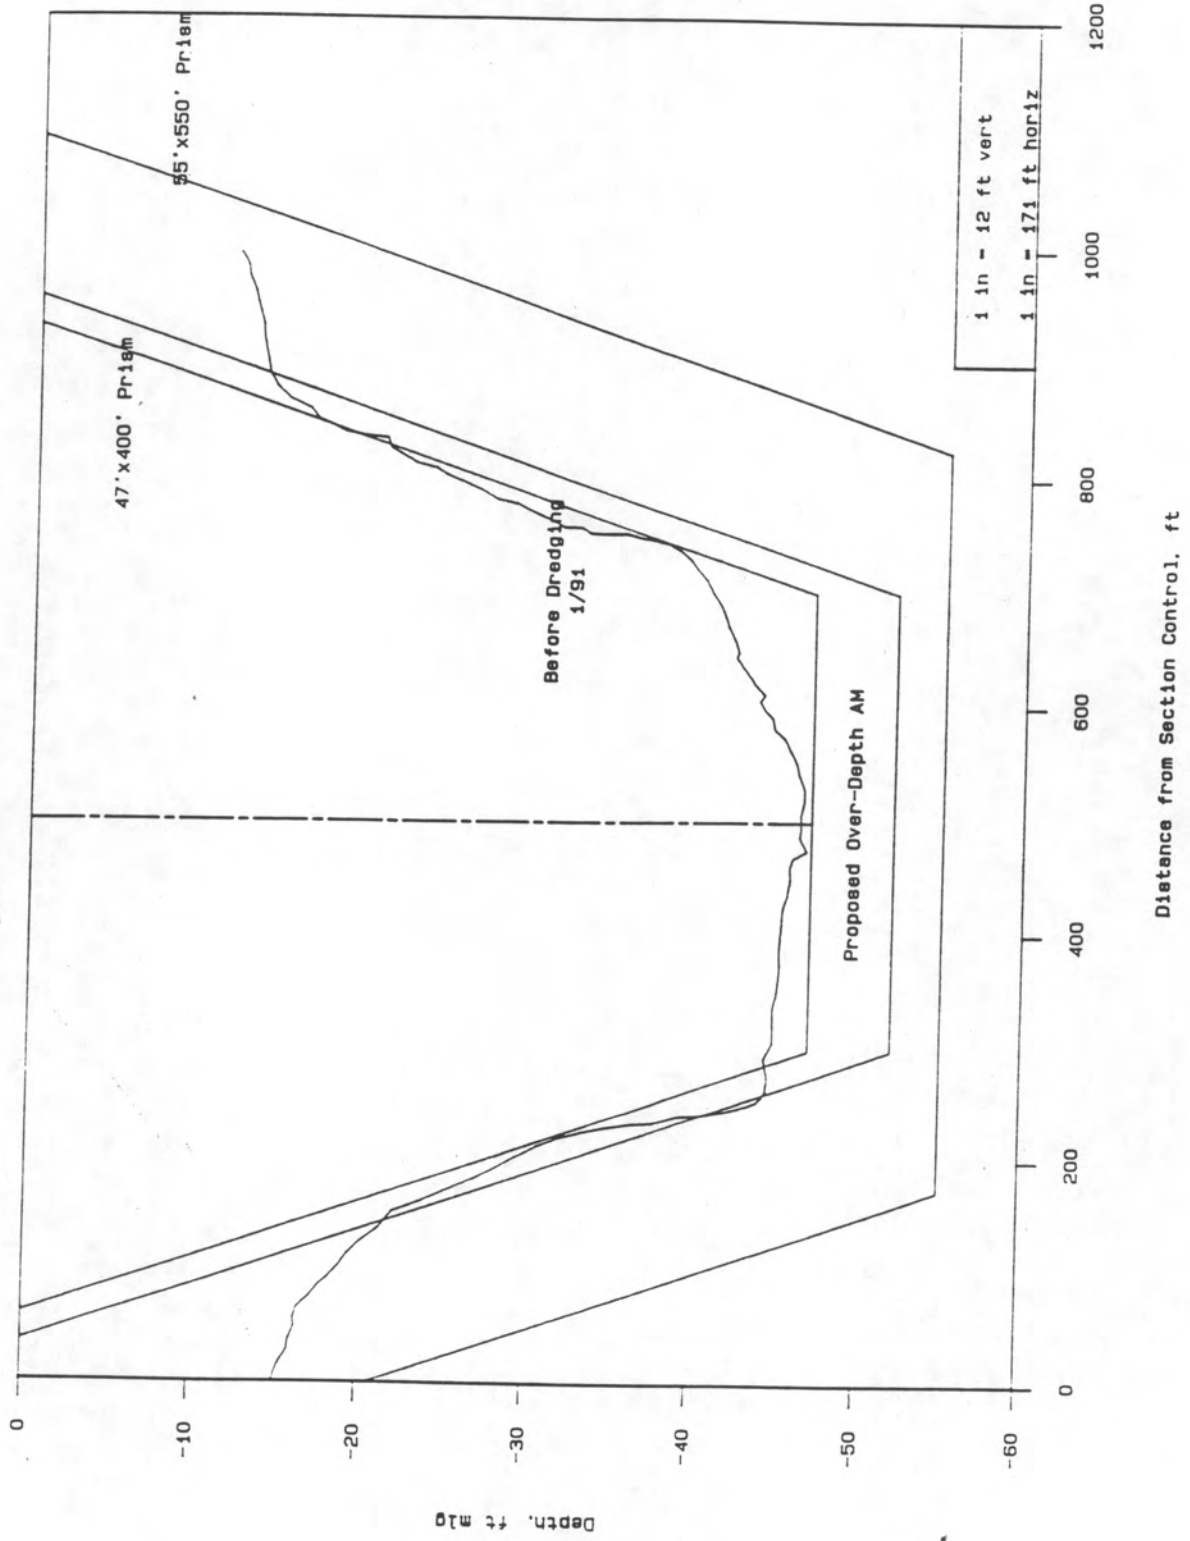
Typical section of the proposed test reach between Stations 717+00 and 782+00 with before dredging 1/91
